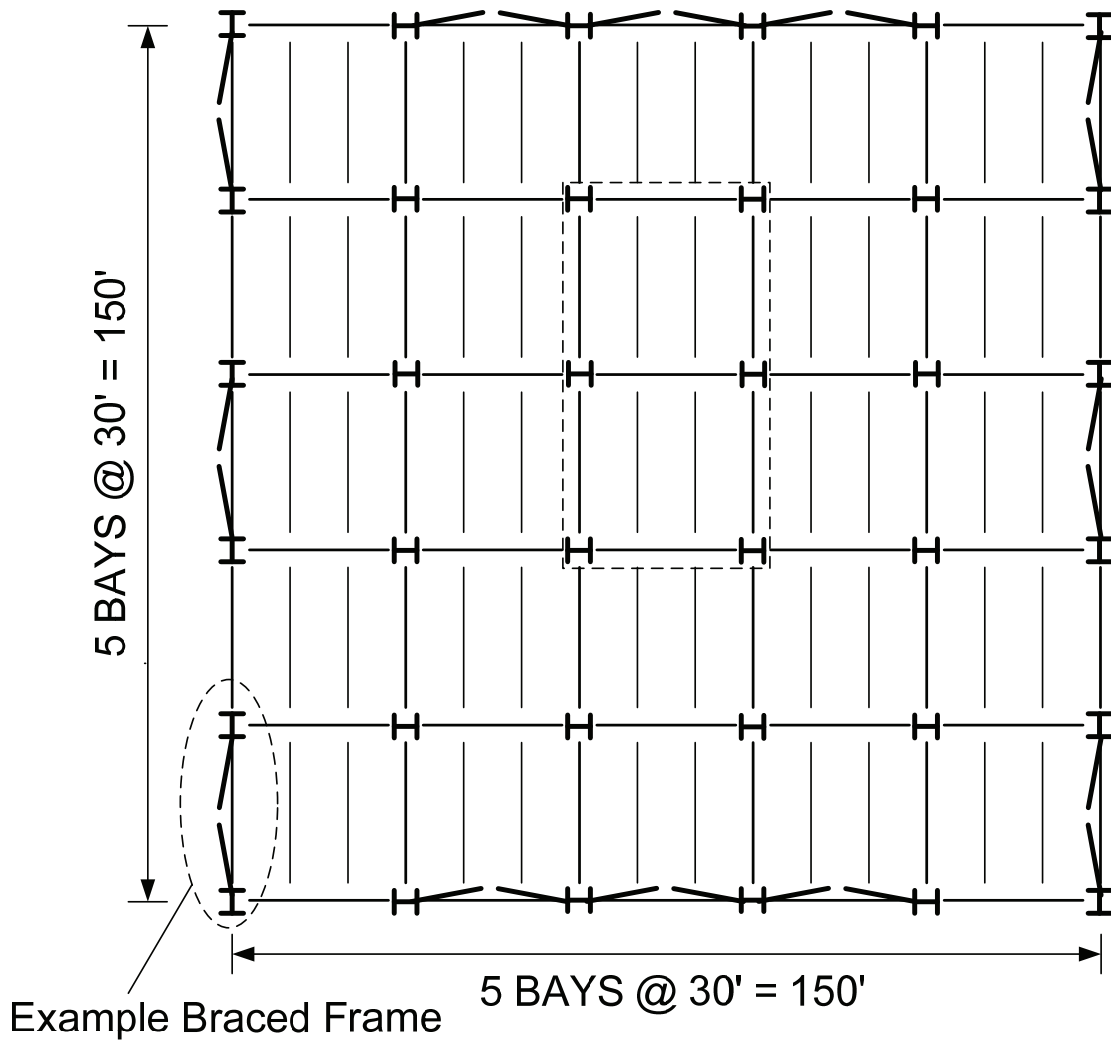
Plan View of 9-Story SAC Building: 9V-PBPD-B Design.
